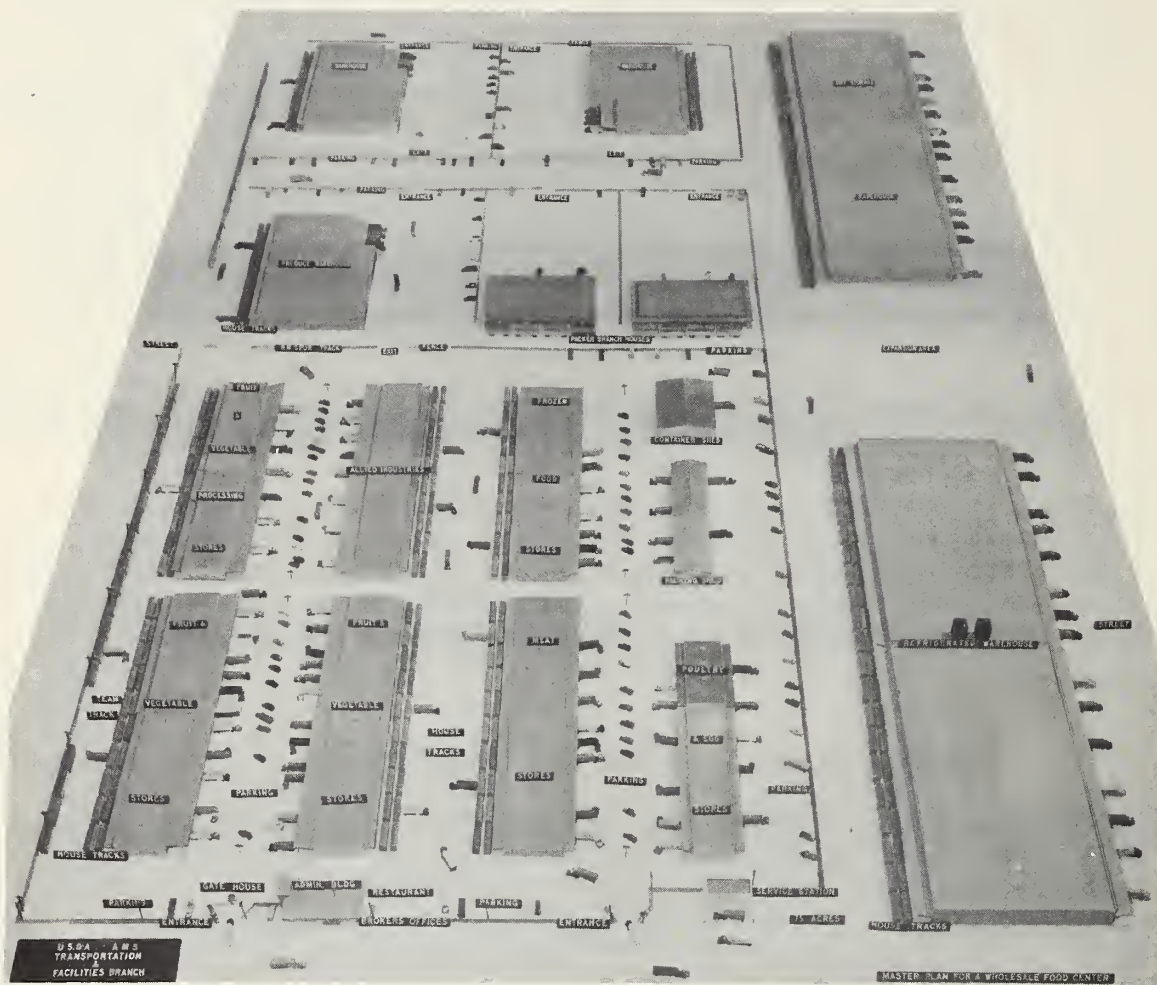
A photograph of a scale model of a master plan for a wholesale food market center.
